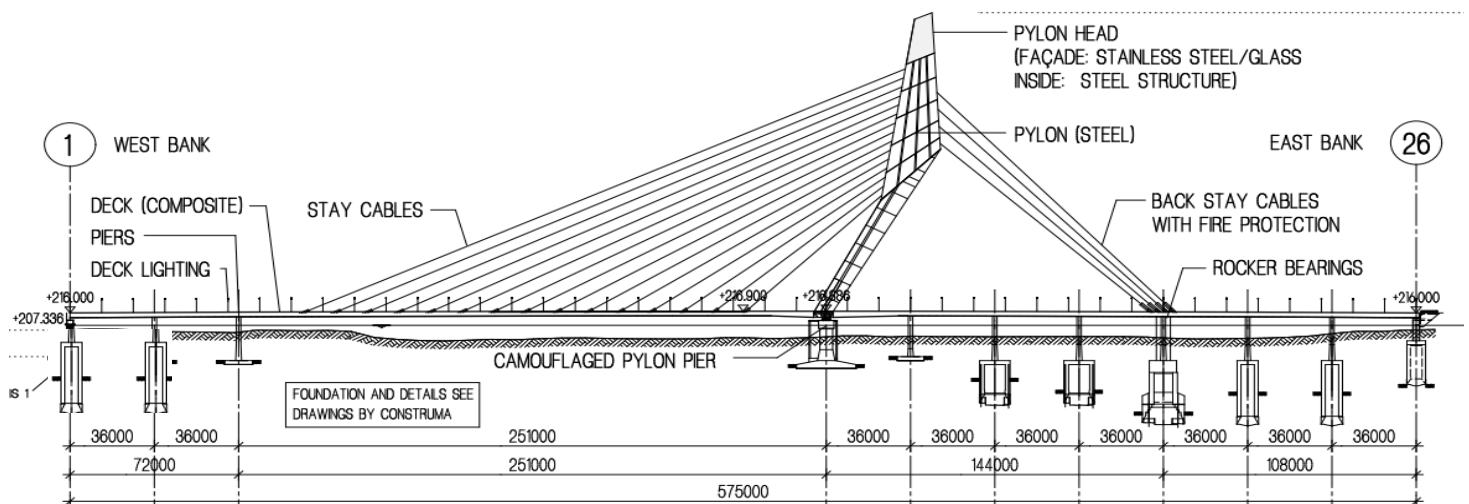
Elevation Showing General Arrangement of Signature Bridge
